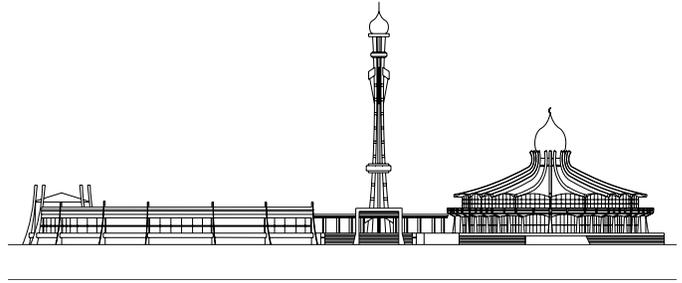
Simple division of elements on façade: base; wall; roof (Ismail 2007)
